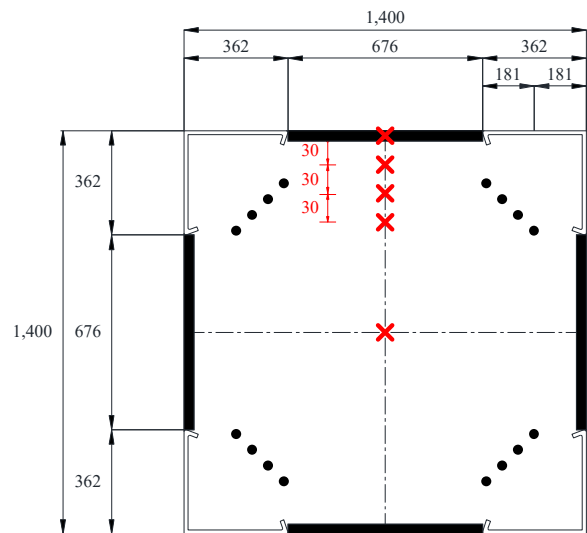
1,400×1,400 specimens: section dimensions and arrangement of thermocouples
